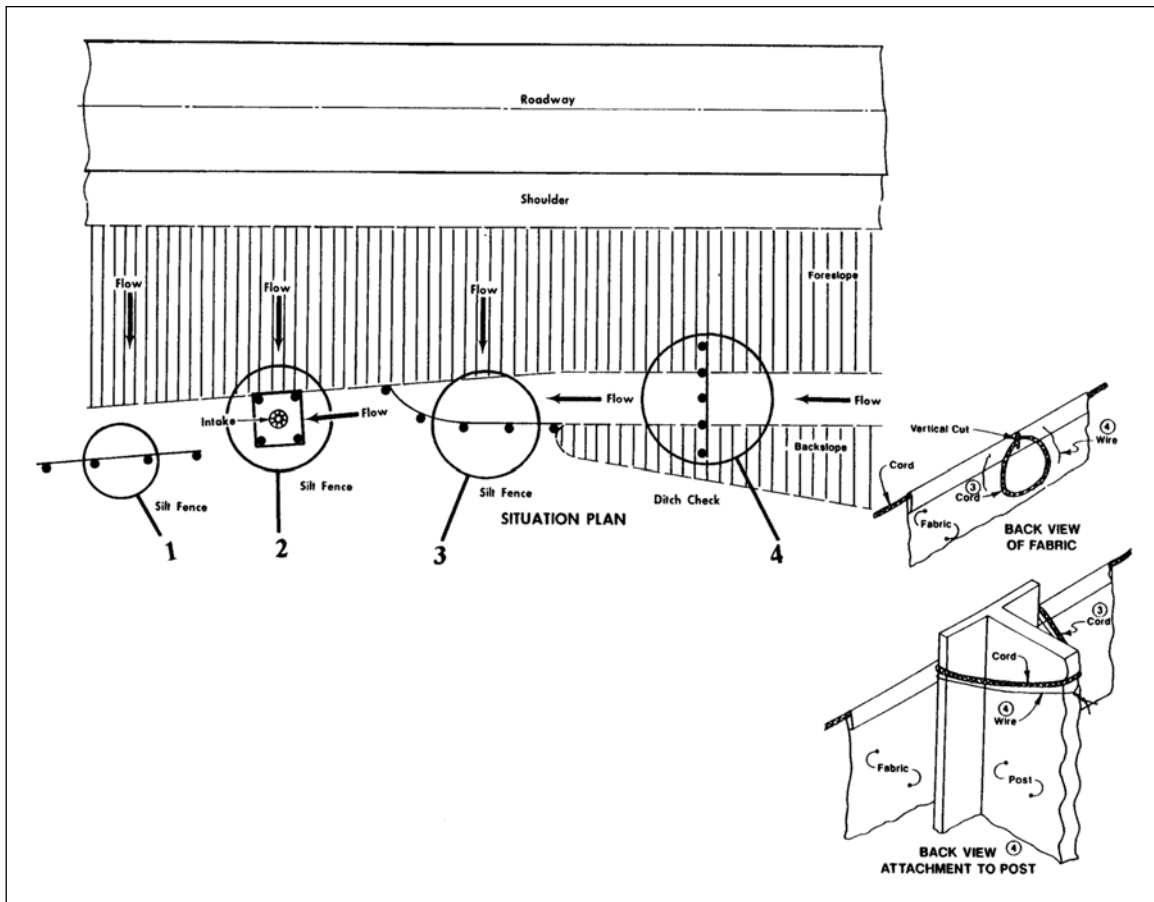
Silt fence situation plan (Source: Department of Civil, Construction, and Environmental Engineering, Iowa State University)
